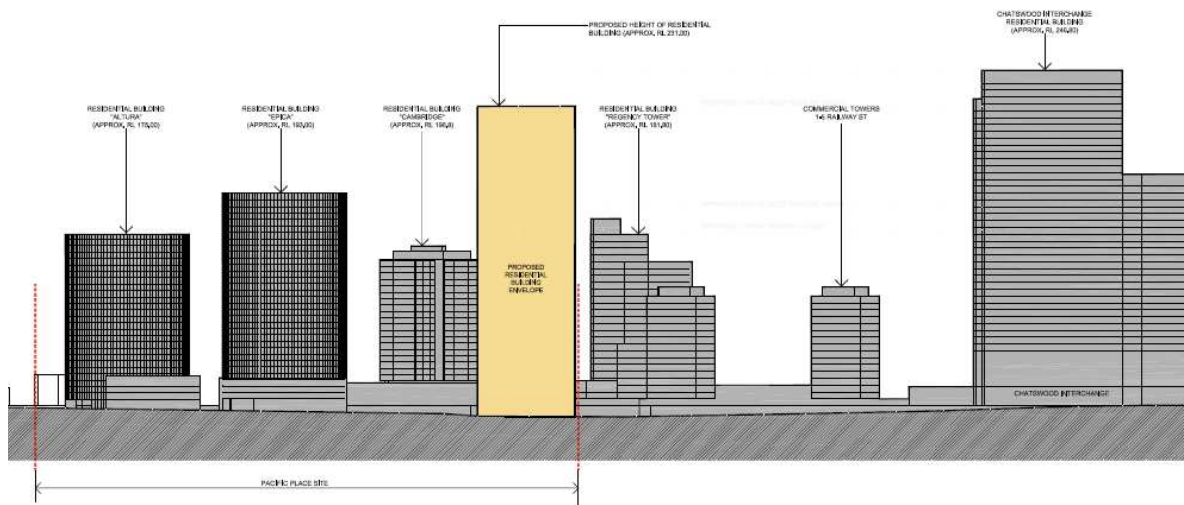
Proposed building envelope within the context of the Chatswood CBD West elevation
